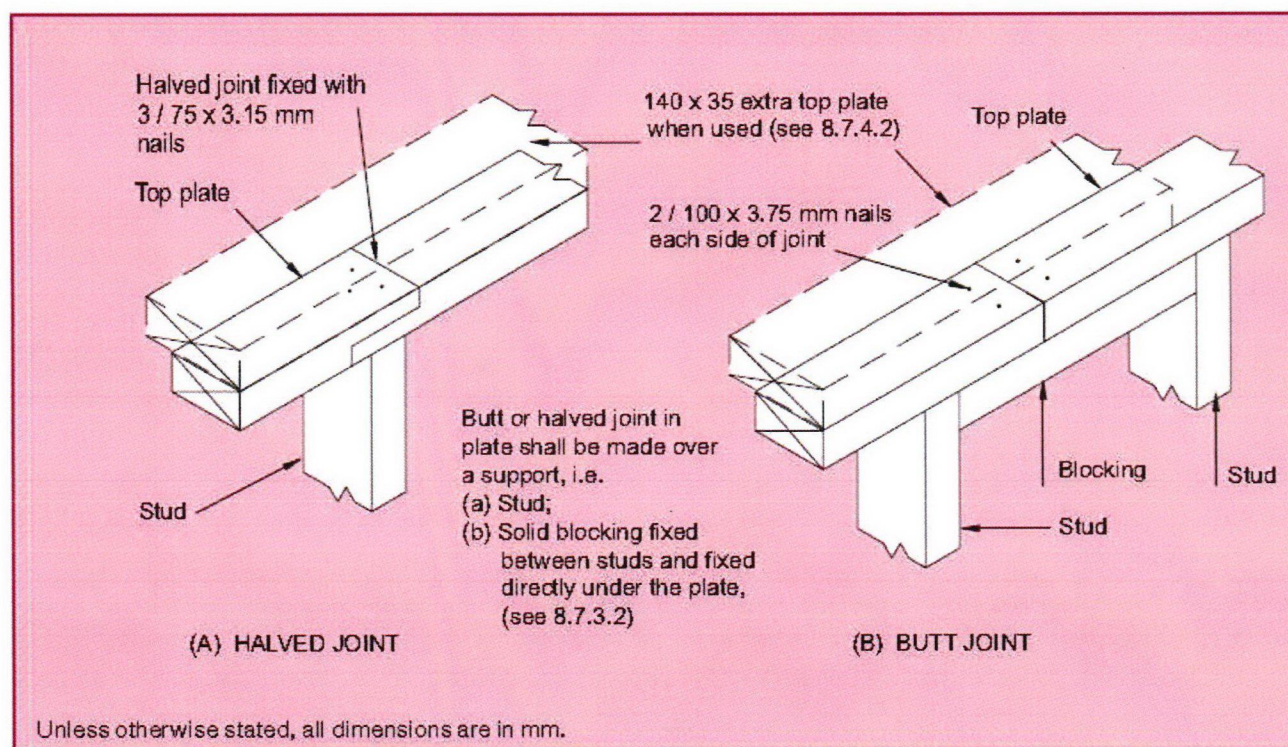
Connecting top plates – Walls not containing bracing (see 8.7.3.2)
